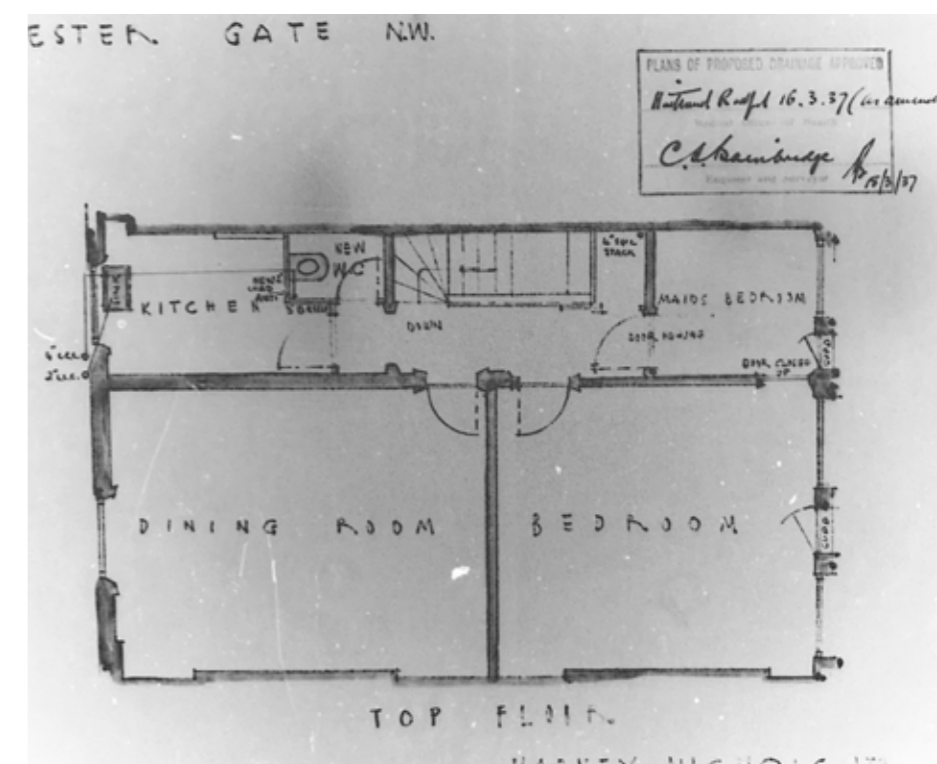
Plan of third floor of 8 Gloucester Gate, 1937
